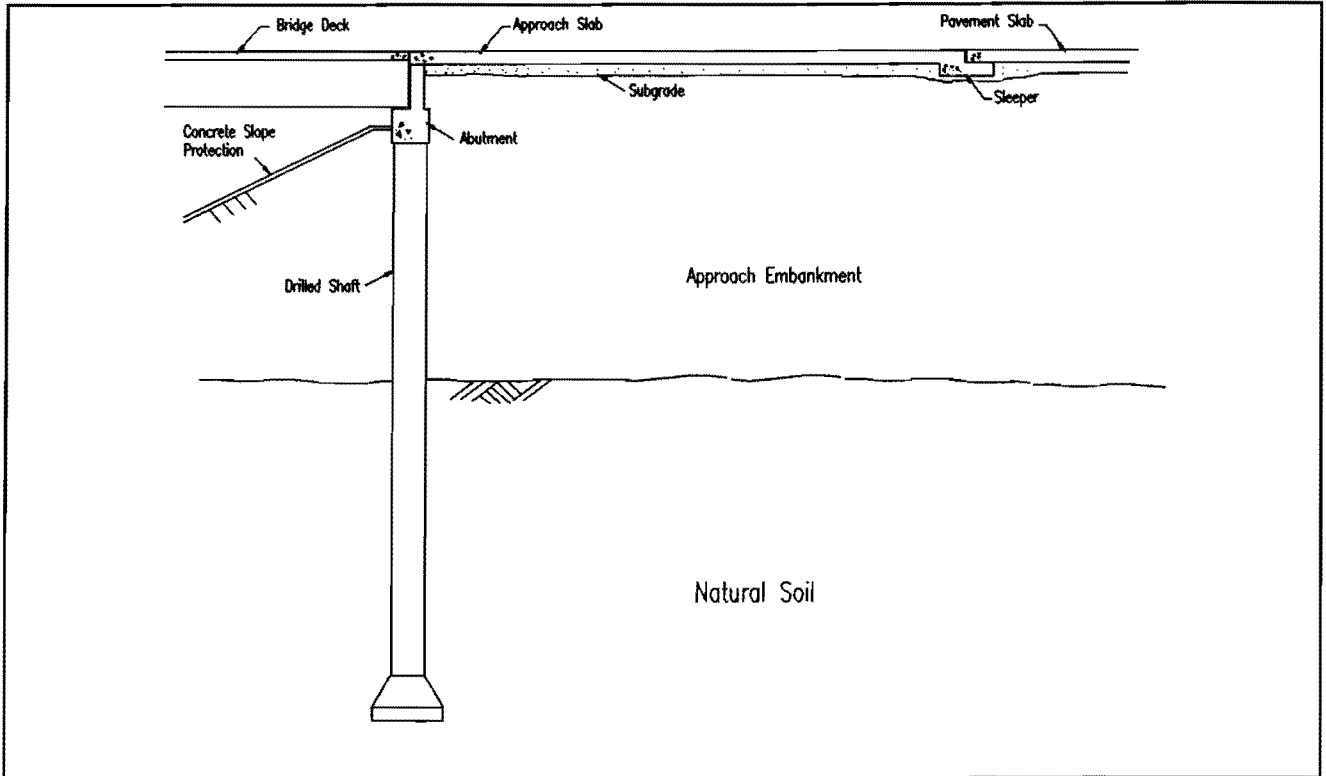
Longitudinal Section Through a Typical Bridge Approach
